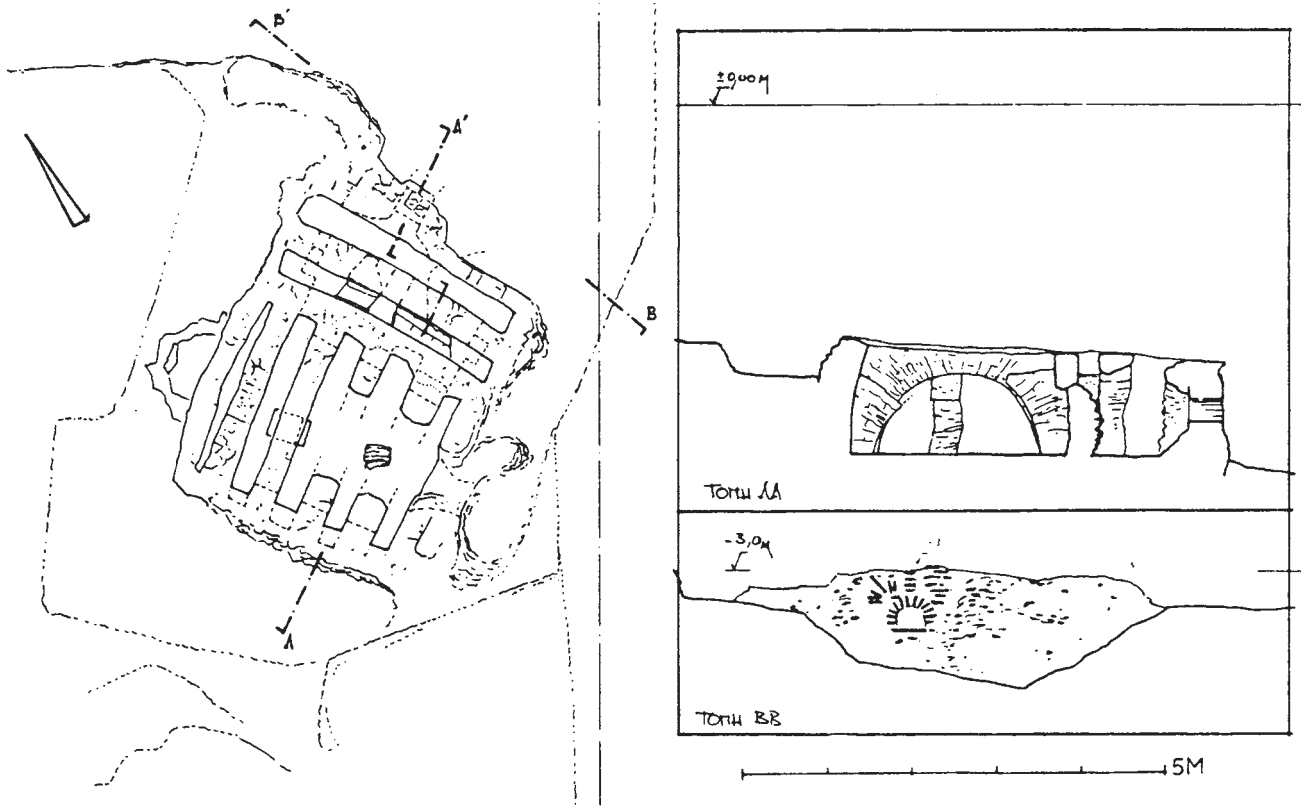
93 Monastēriou Street, plan and sections of the kiln.
